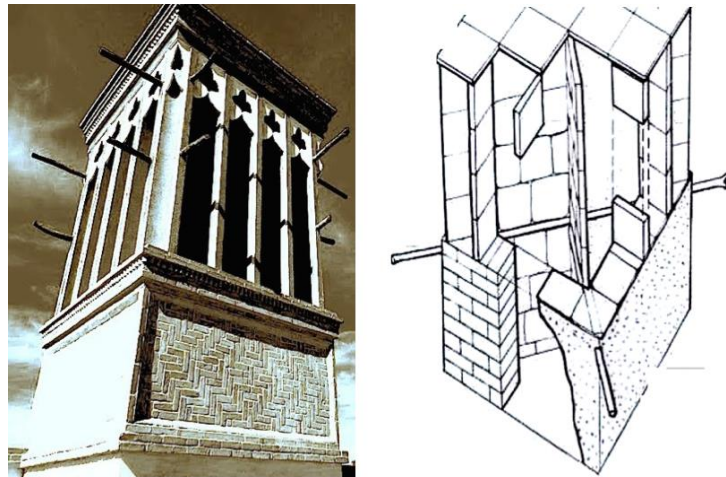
Typical Iranian badgir. 3b Detail of badgir that shown internal diagonal wall.
